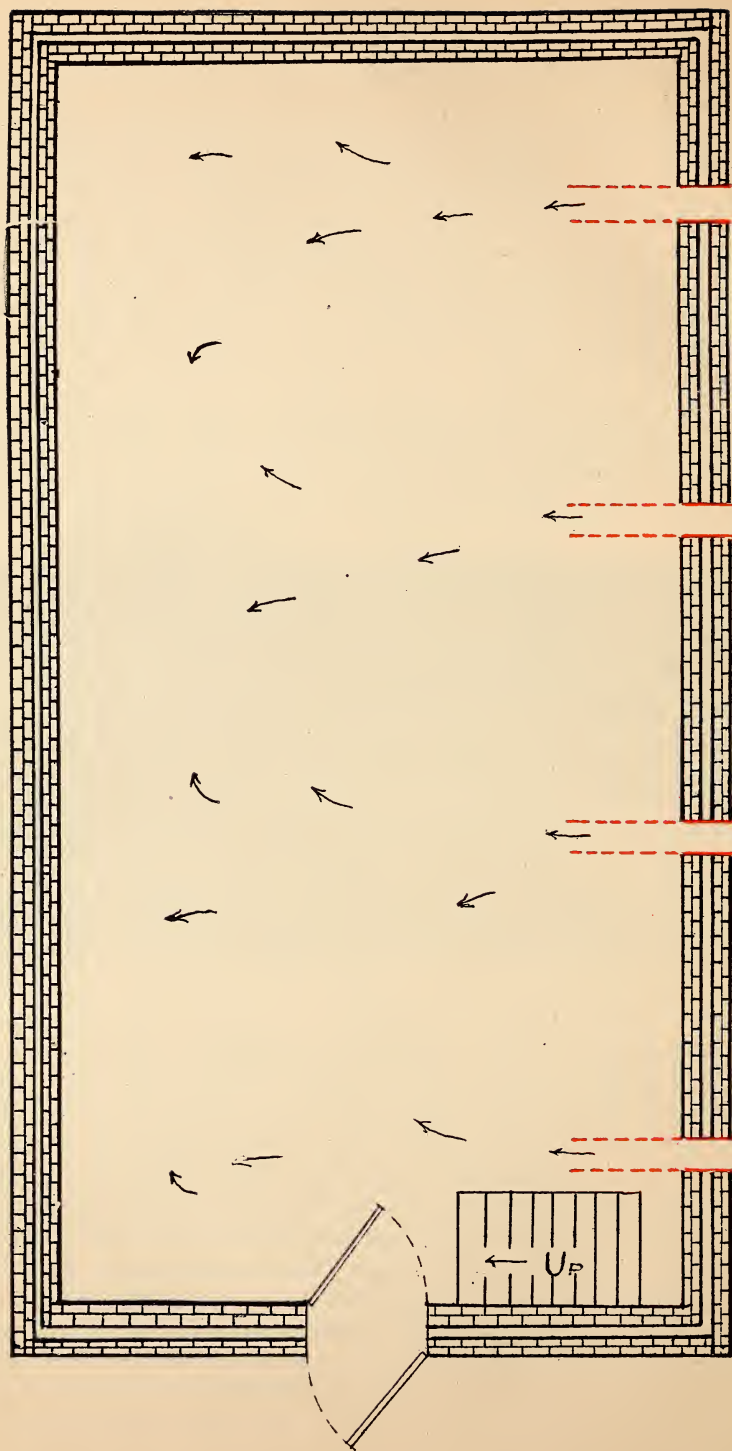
Ground floor of Mr. J. R. Sams' apple storage house, showing ventilating system.
